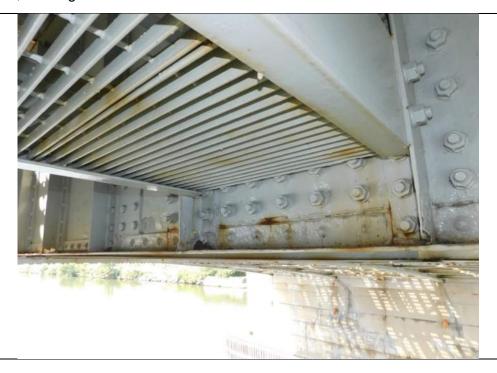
[Span 5, South Leaf] -Floorbeam 2n, south face between G3W-G4W, holes in bottom of web stiffeners up to 4" x 1", Looking Northwest
